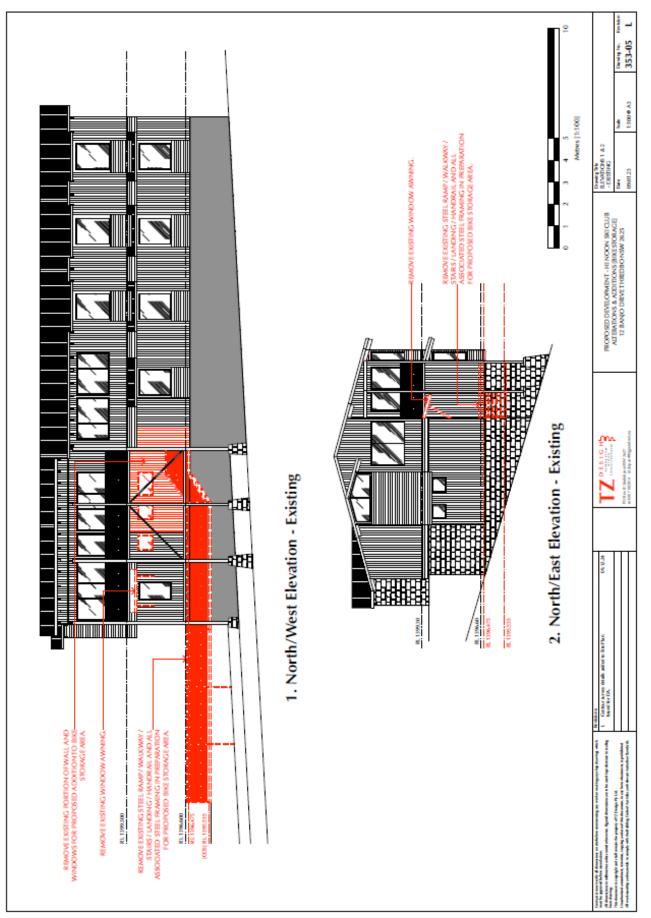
North/ West and North/ East Elevation - Existing (Source: TZ Designs, January 2025)
